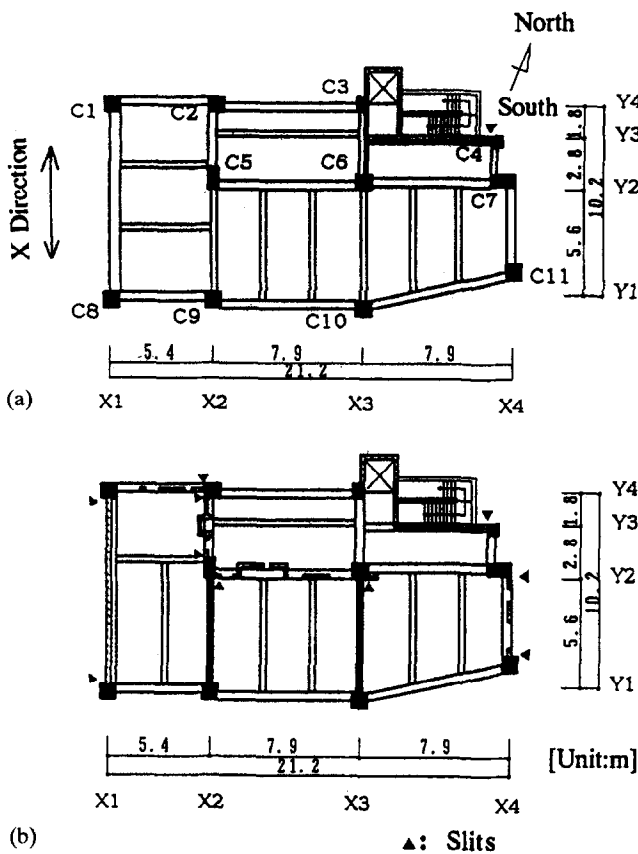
Plan Views: (a) first story; (b) second through seventh stories.
